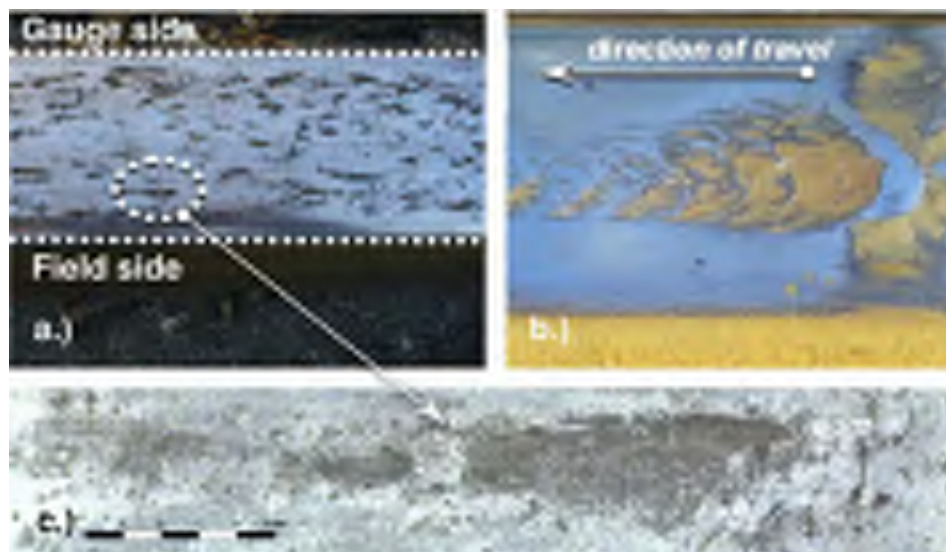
a) The longitudinal failures; b) macro “comet”- shaped defect on the rail running surface c) Panorama photo of digital microscope
